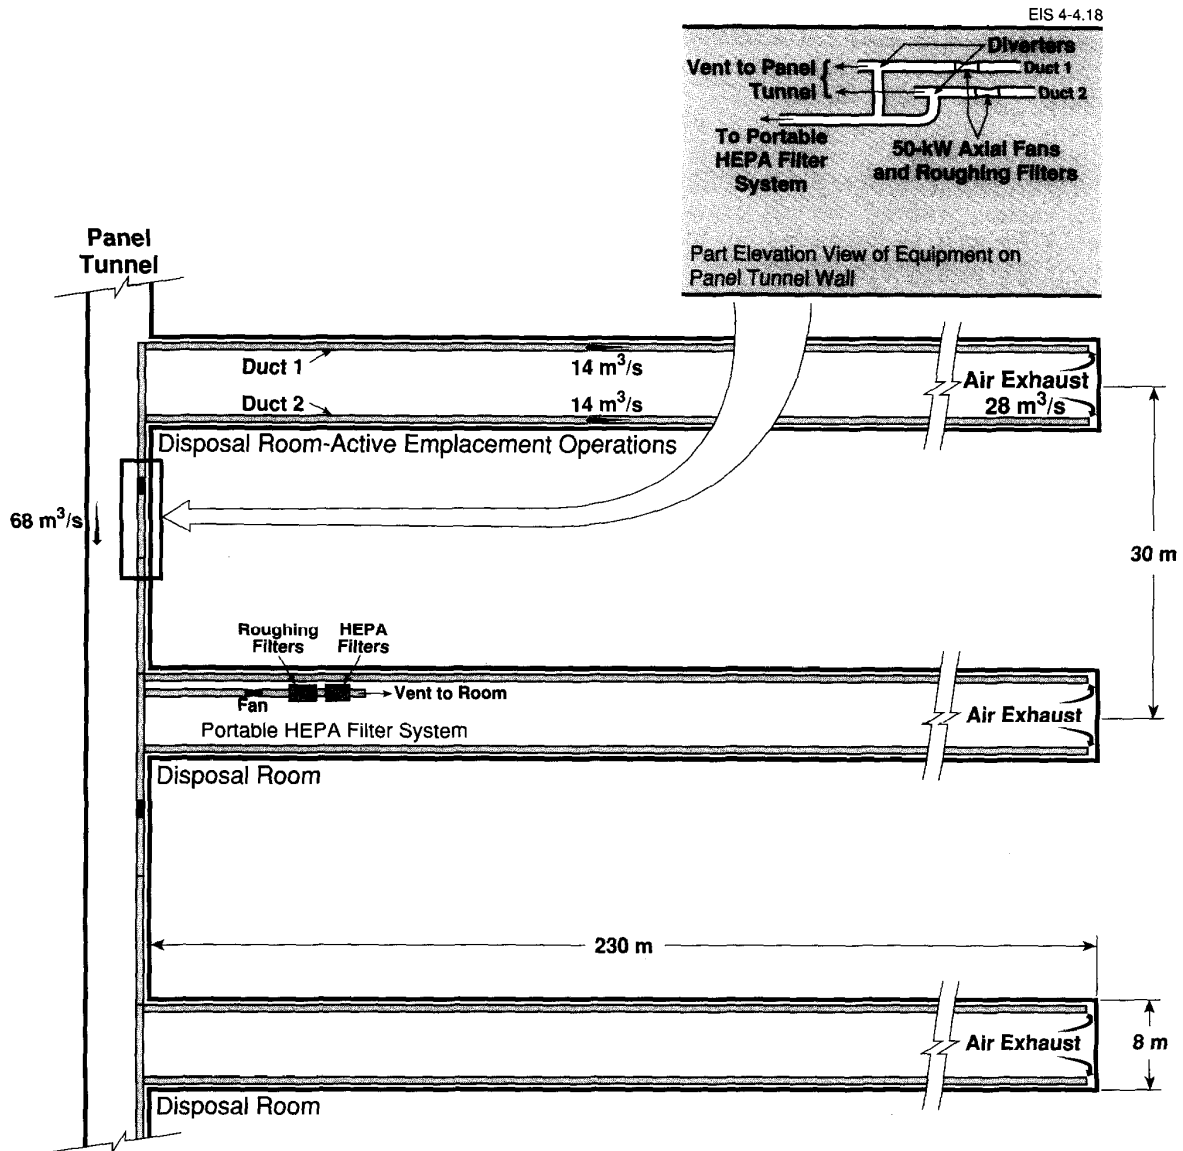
Disposal-Room Ventilation During Container Emplacement - Partial Plan
